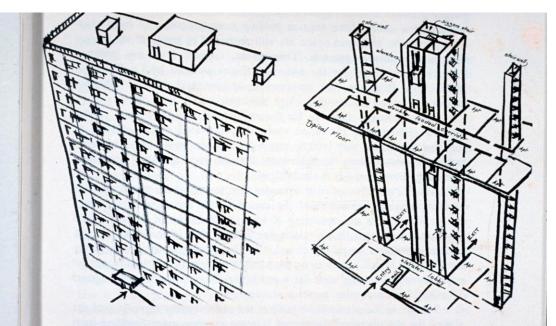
Typical Double-Loaded Corridor Apartment Building. The view at left is of an apartment building as it is typically seen. At right the building is seen in an x-ray view to illustrate how the horizontal and vertical circulation elements are disposed.
